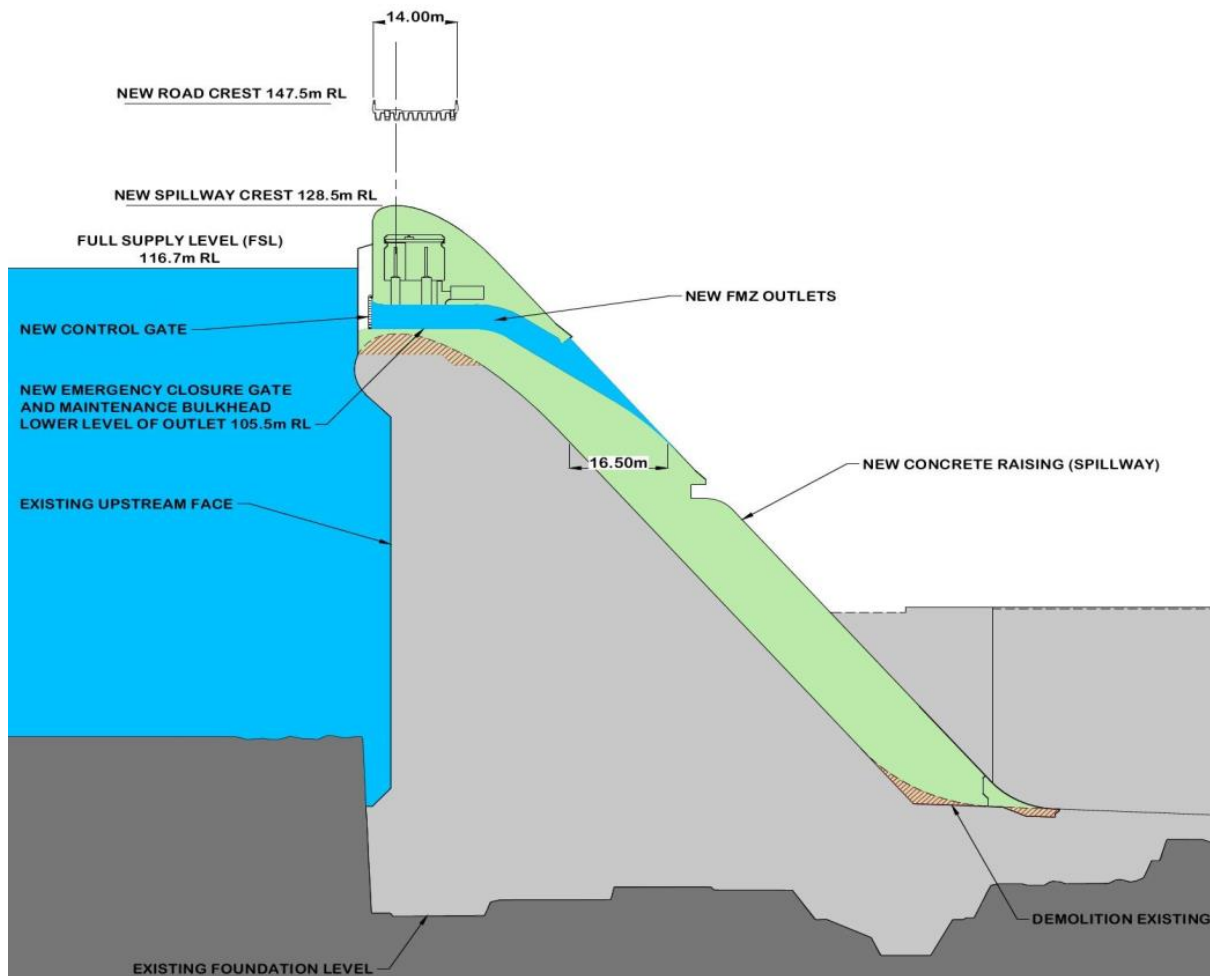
Cross section of proposed dam raise through the central spillway works⁵
